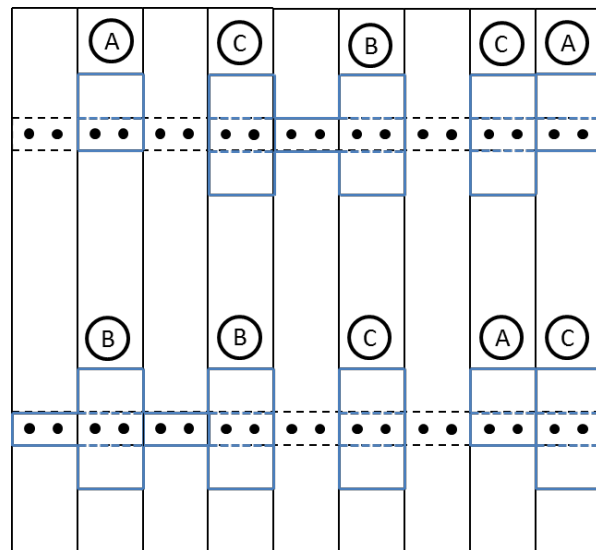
Specification of test specimens: A – loading perpendicular to joist, B – loading parallel to joist, C – loading in torsion
